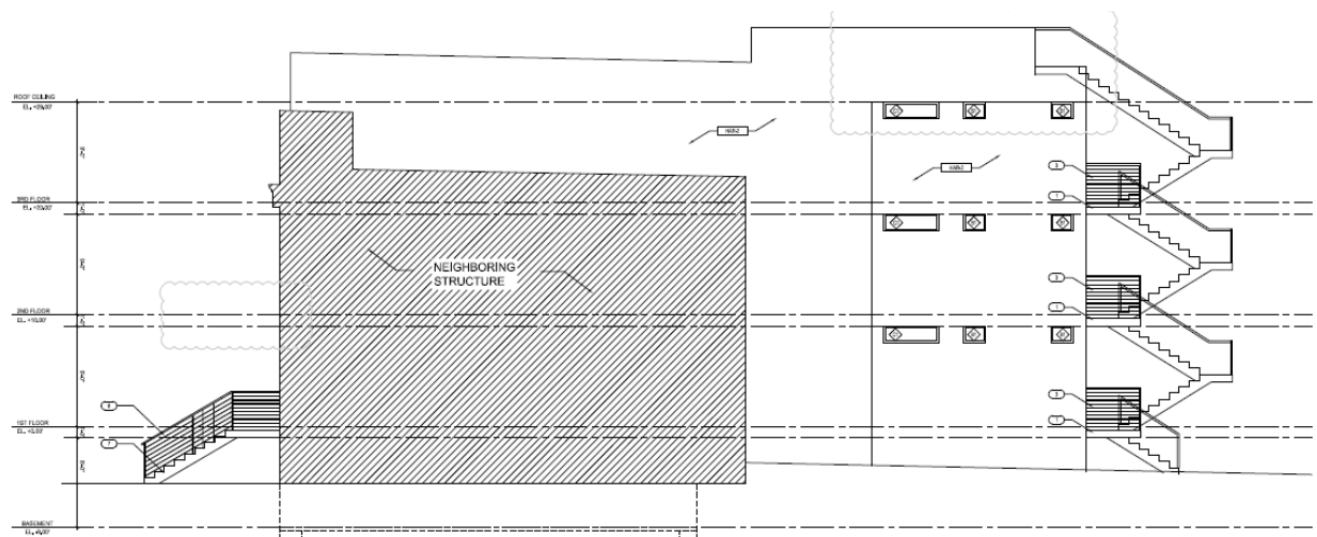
, depicts side elevation of the subject property and the neighboring structure (although, a front porch exists on 65 V Street NW, the plans call for its removal on 67 V Street NW).
